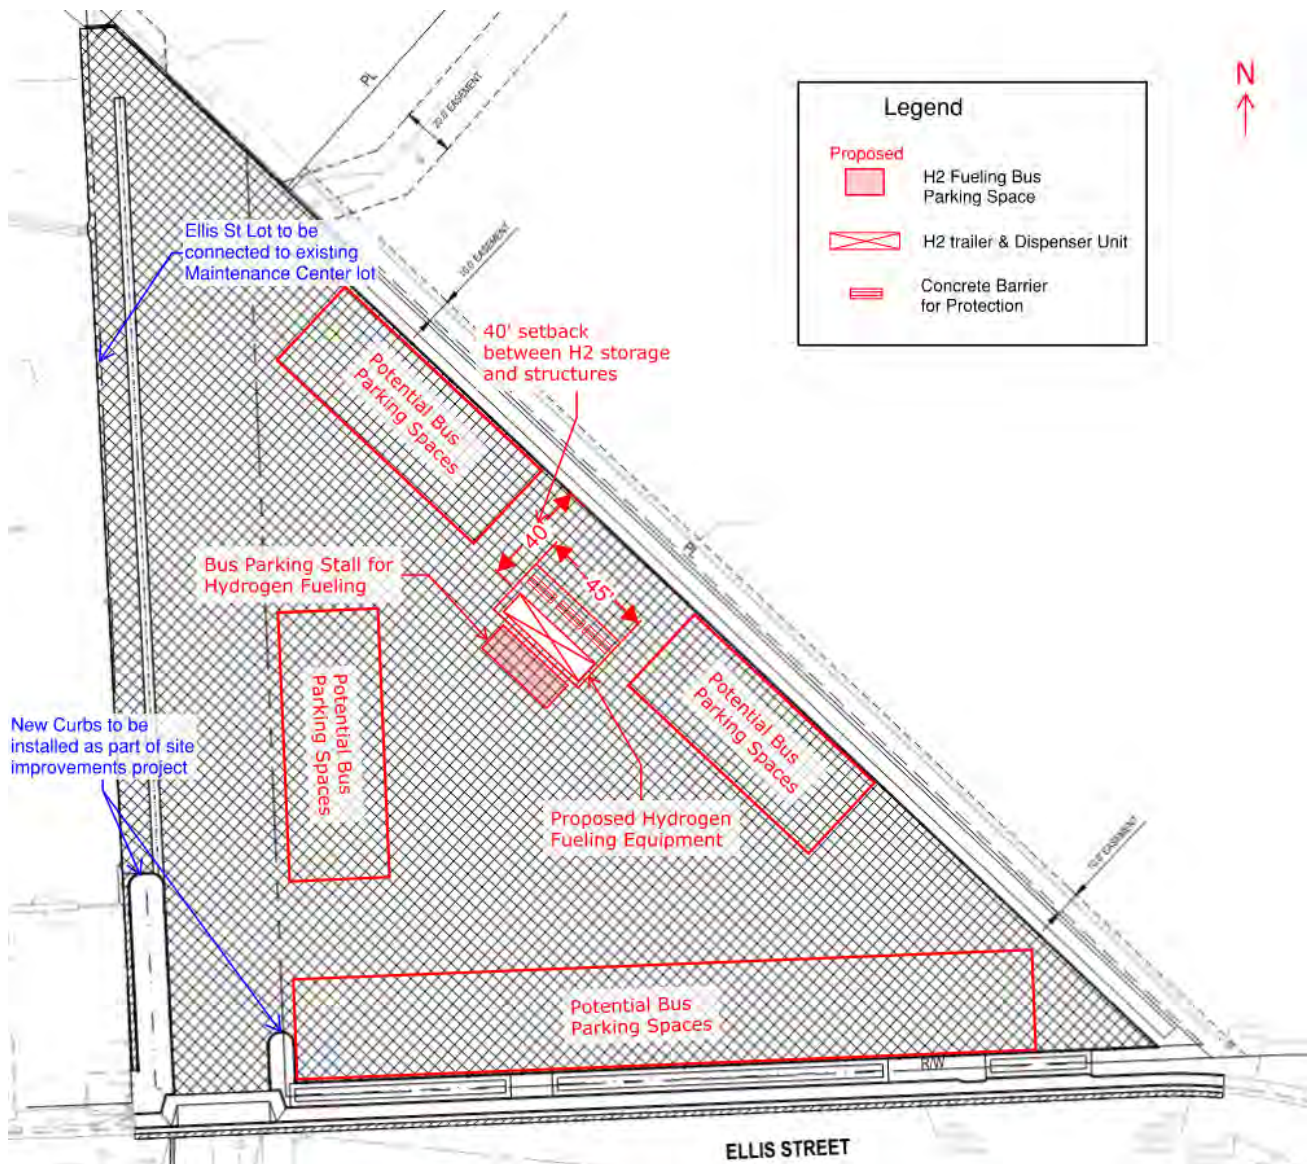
ELLIS ST LOT HYDROGEN REFUELING STATION LAYOUT
